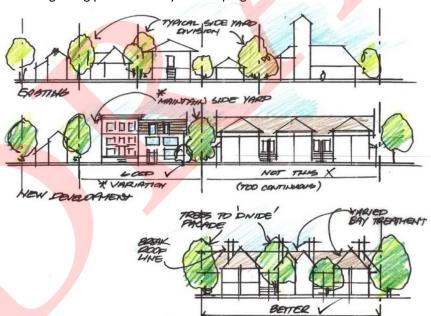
Examples of recommended streetscapes applicable to the Mountain View area.
